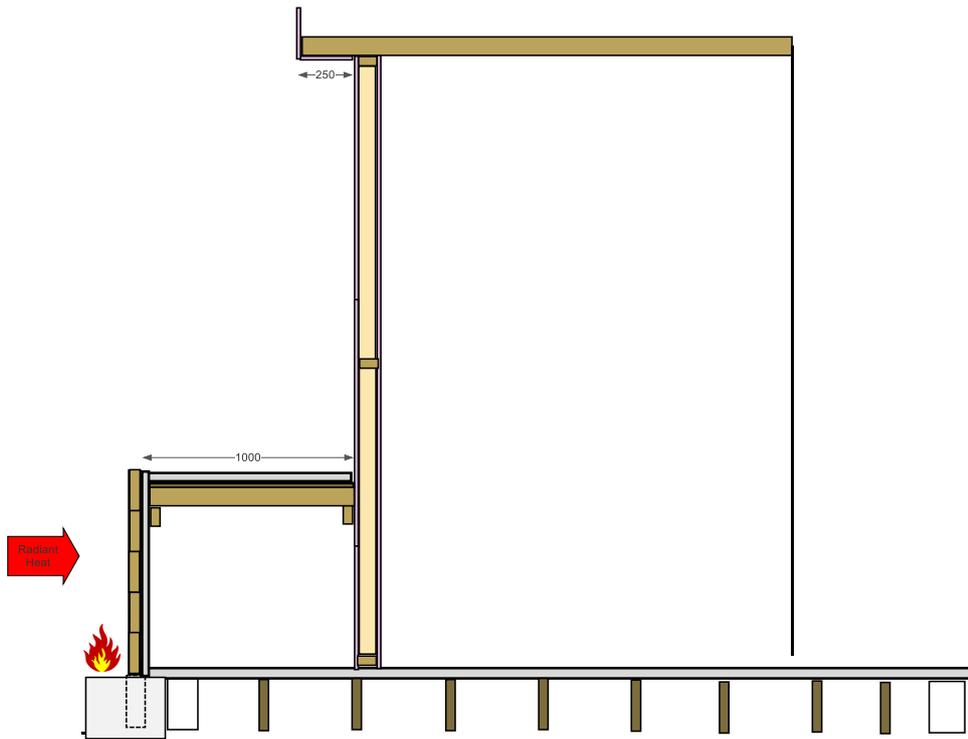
Section BB Retaining wall below house level 1 m in front of façade facing bushfire
